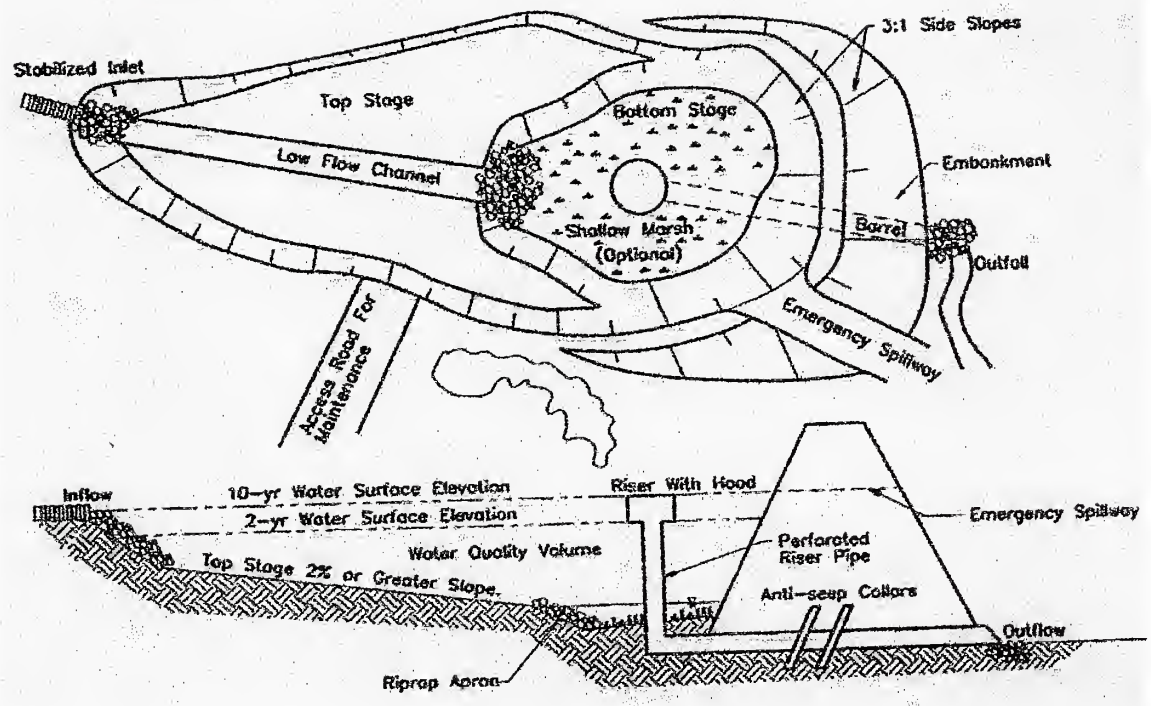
A typical plan view and cross section of detention pond with Rip-rap Source: Urban Drainage Design Manual (No.22)
